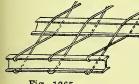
Securing Rods in Lindsay's Fireproof Floor.
